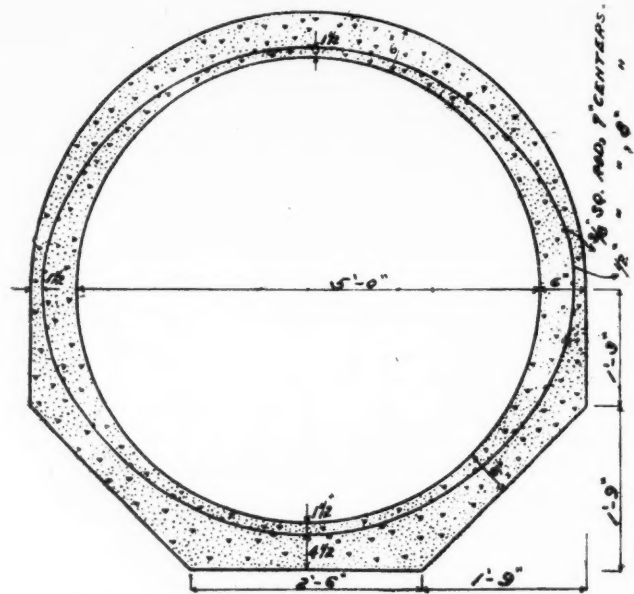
SECTION OF REINFORCED-CONCRETE CONDUIT
